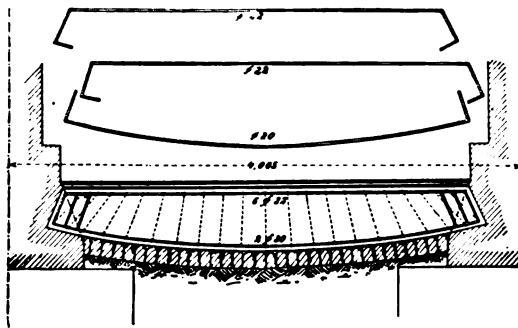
Reinforcement of the beams of a water-tight cellar.
